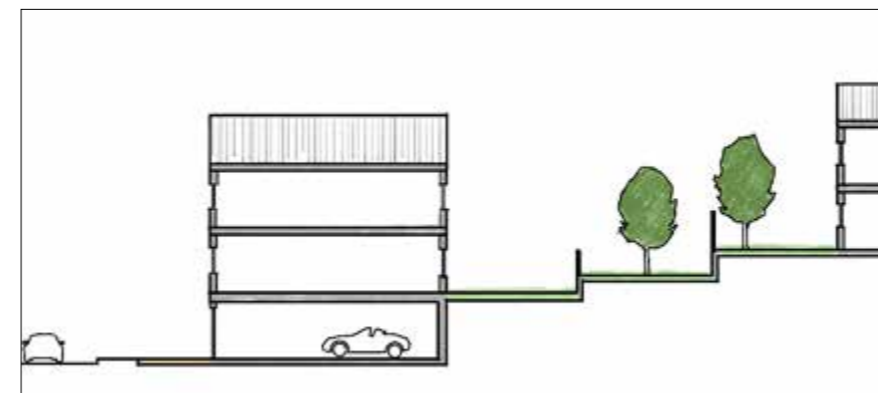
Steeper sites are more likely to require bespoke housing designs that will be more successful in responding to challenging gradients – where to locate car parking, rooms and minimise the height of retaining structures by terracing gardens
